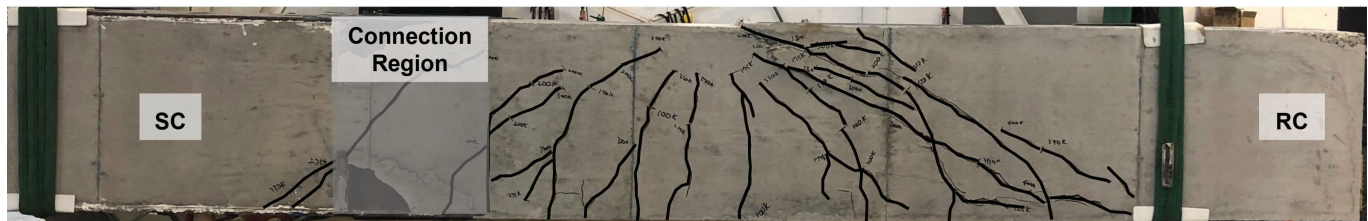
Concrete crack pattern (west side) (OOPV-C).
